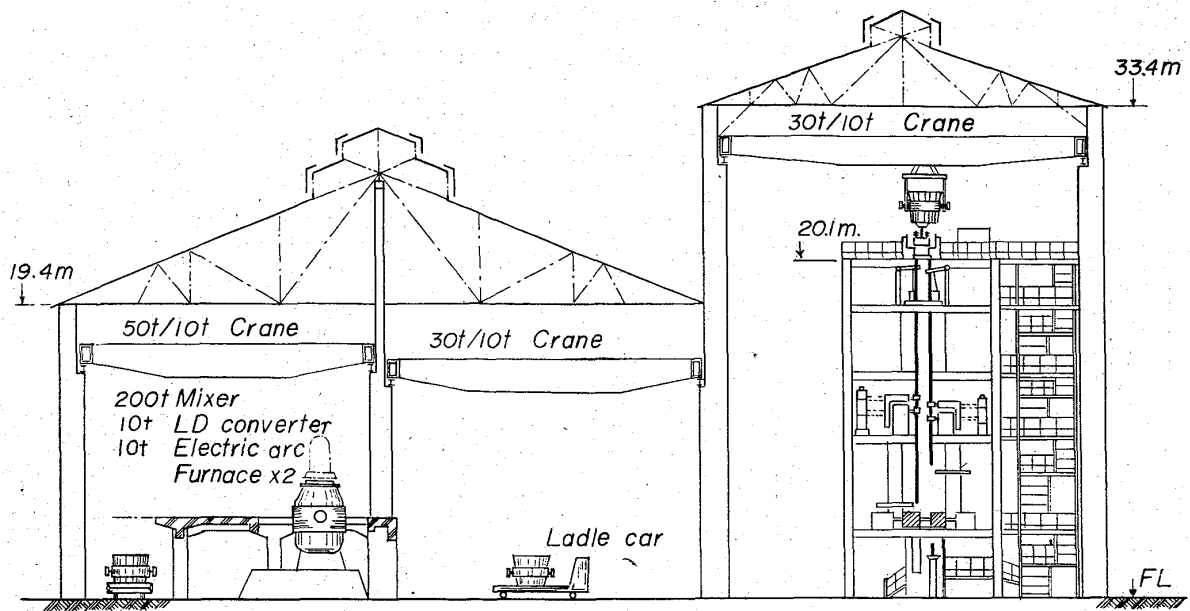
Cross section of steel plant North Japan Special Steel Hachinohe Works.
